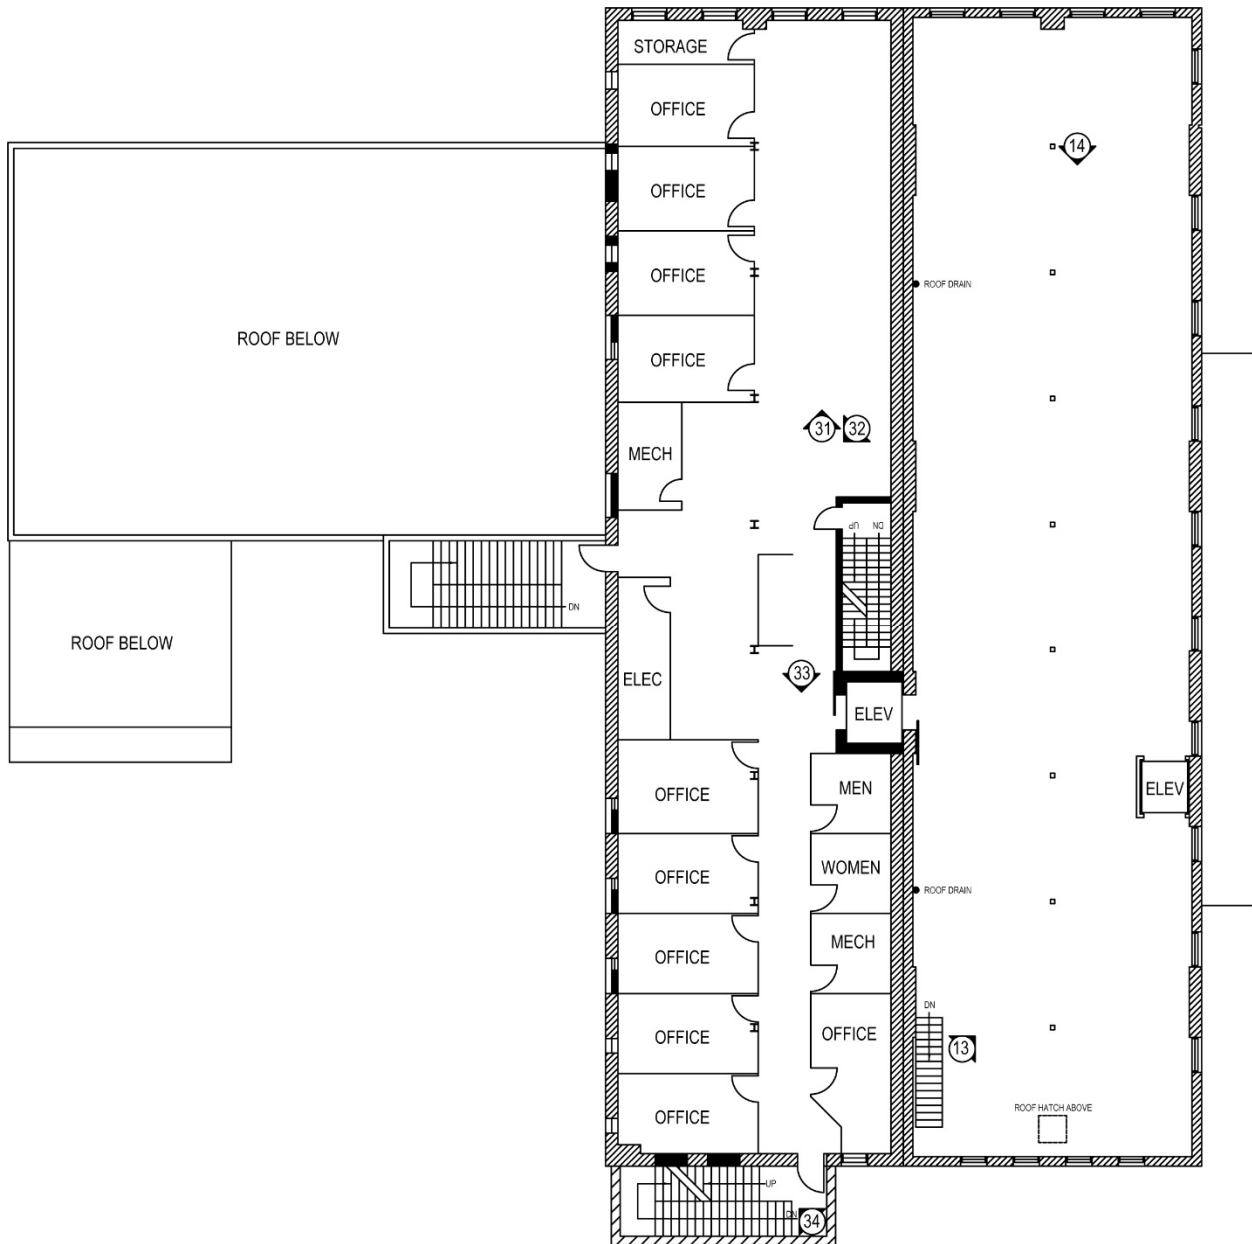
Fourth Floor Plan with Photo Locations (not to scale)
